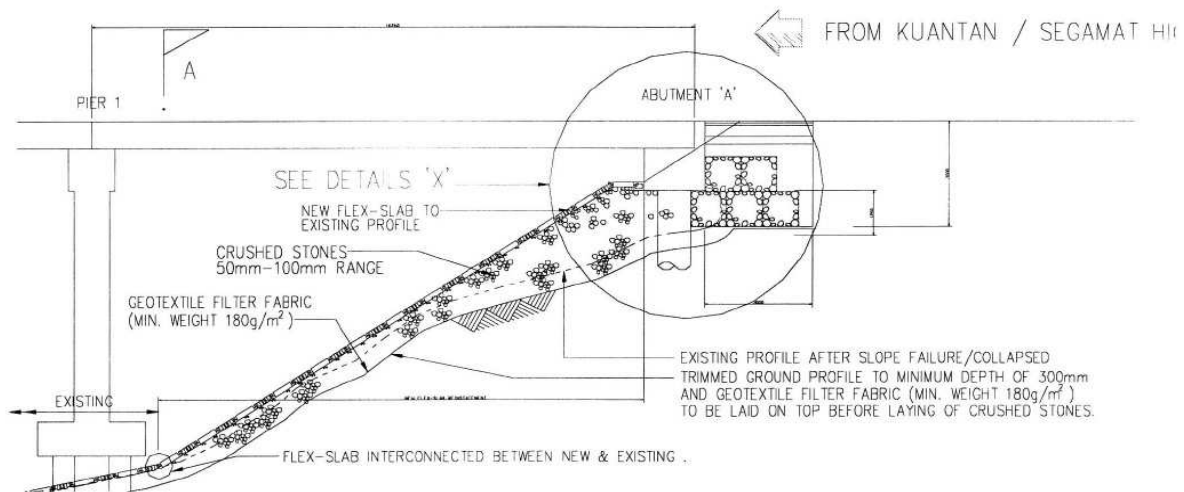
Sectional View of Bridge Abutment at Pukin River Bridge
